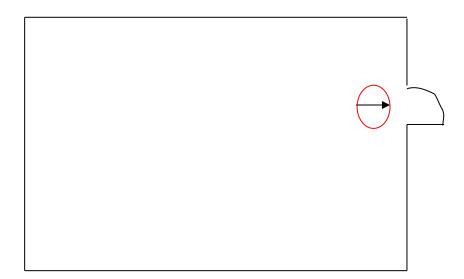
Small garage with only one escape route, i.e. a travel route no longer than 30 m to doors leading to the open.
